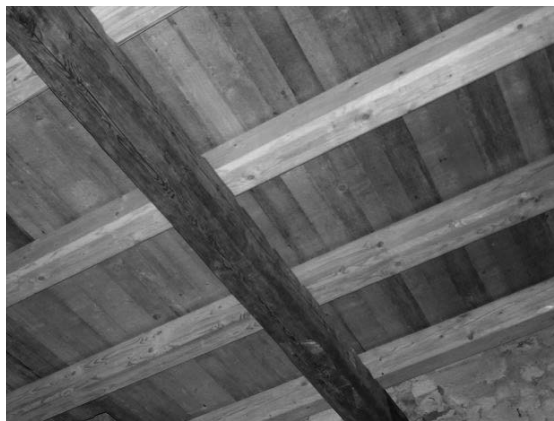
New and old (recovered) structural elements used as part of the ceilings
